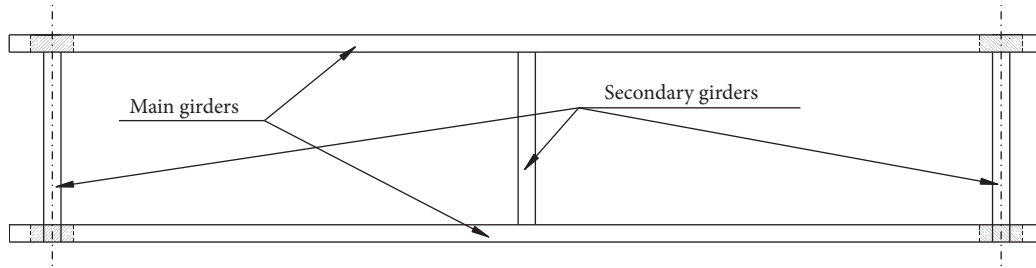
Bottom plan view of the GFRP-concrete hybrid structure.
